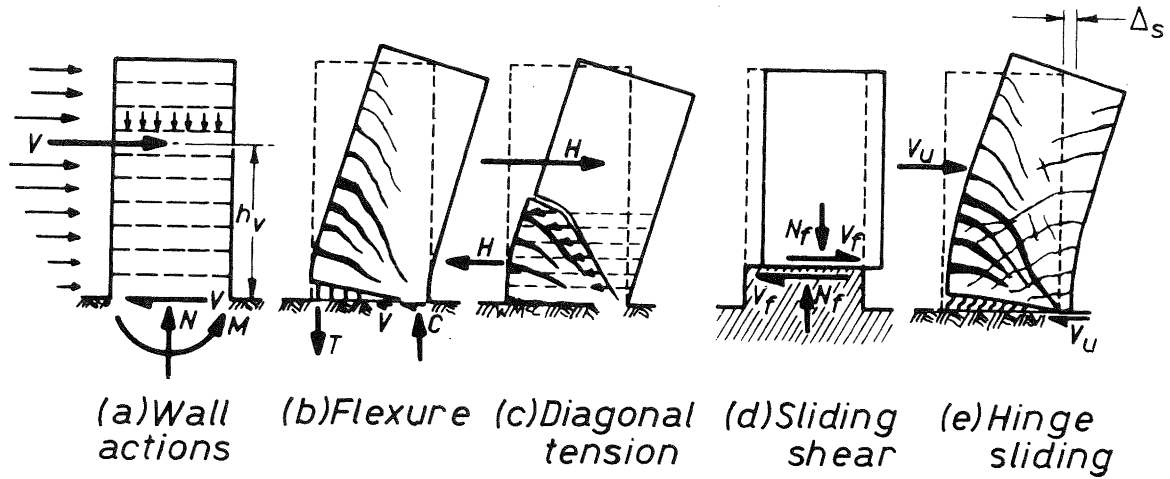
Possible Failure Modes in Cantilever Shear Walls
